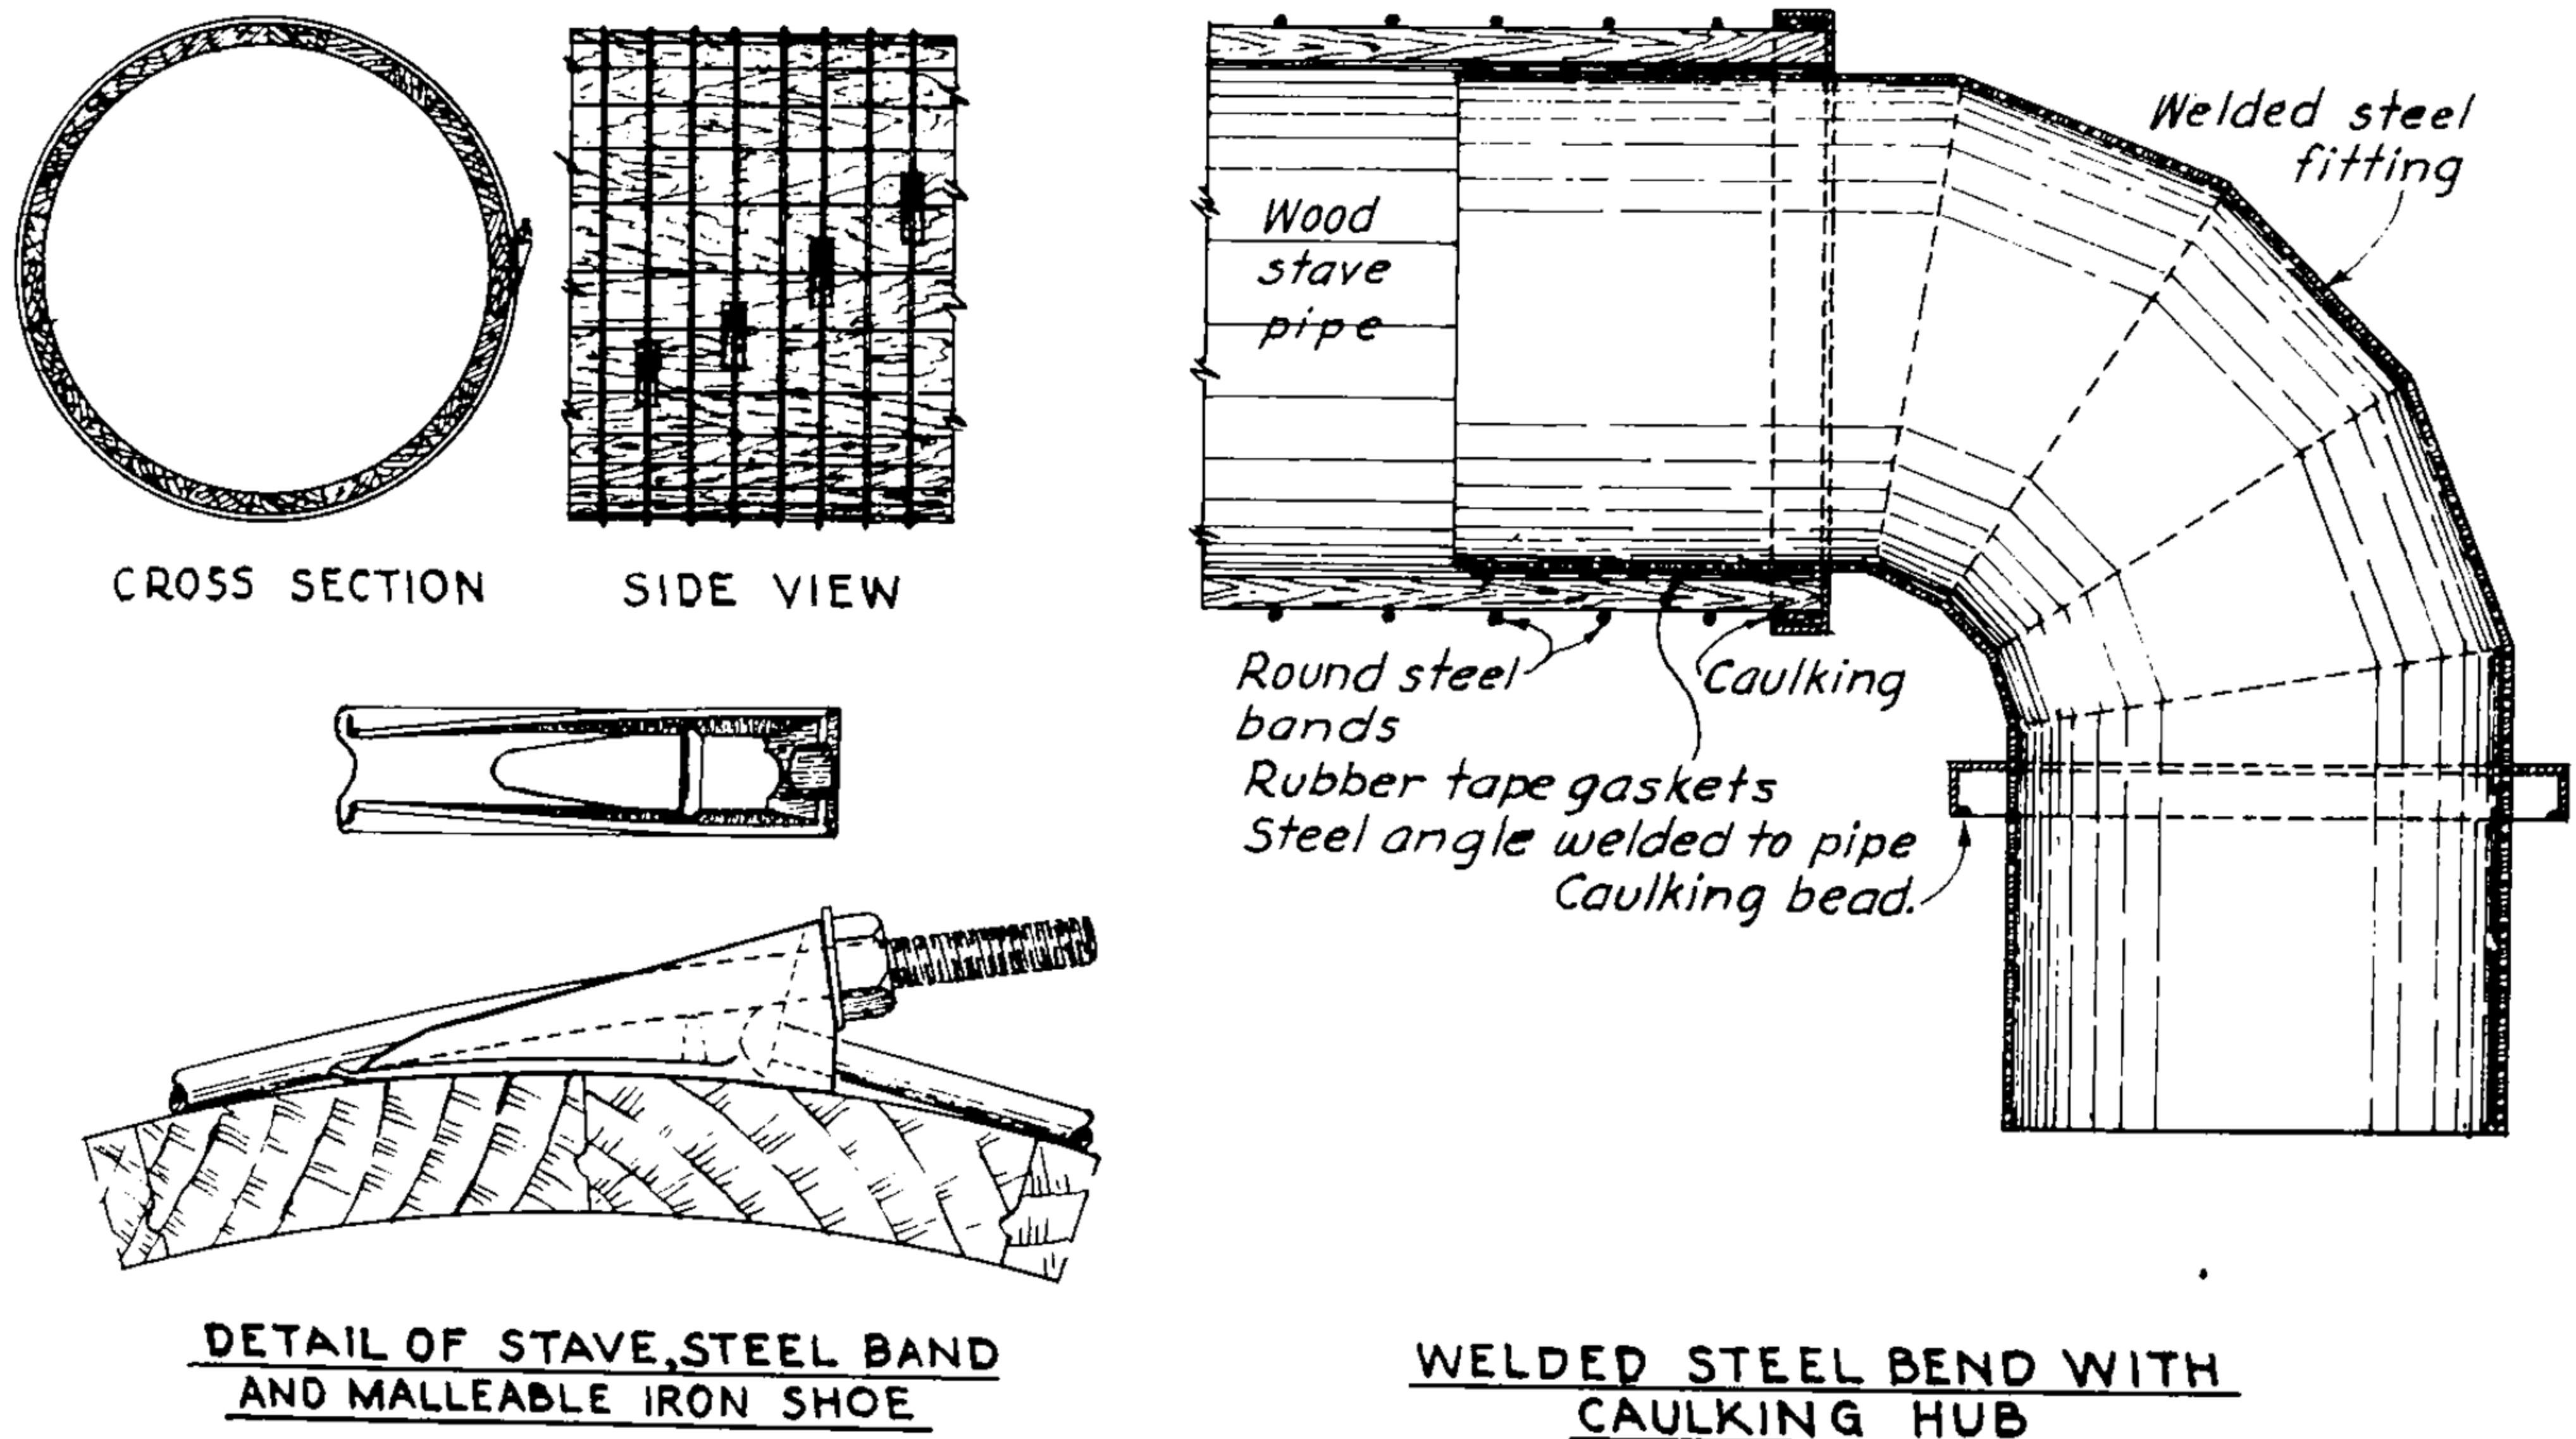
FIG. B- CONTINUOUS WOOD STAVE PIPE AND FITTINGS.
